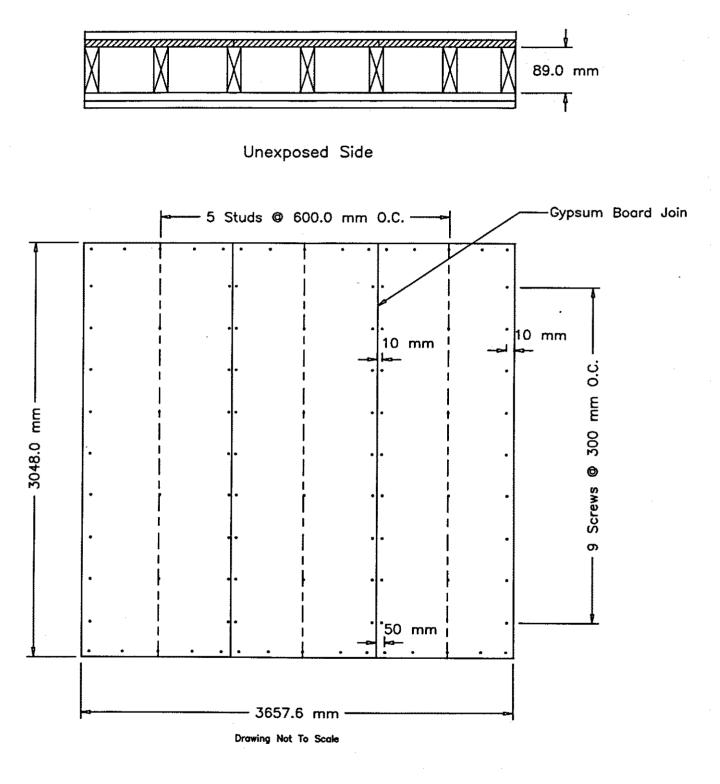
Screw Locations For Wood Stud (600 mm O.C.), 2x2 Gypsum Board Layers, Full-Scale Assembly, Base Layer Gypsum Board, Fire Exposed Face
